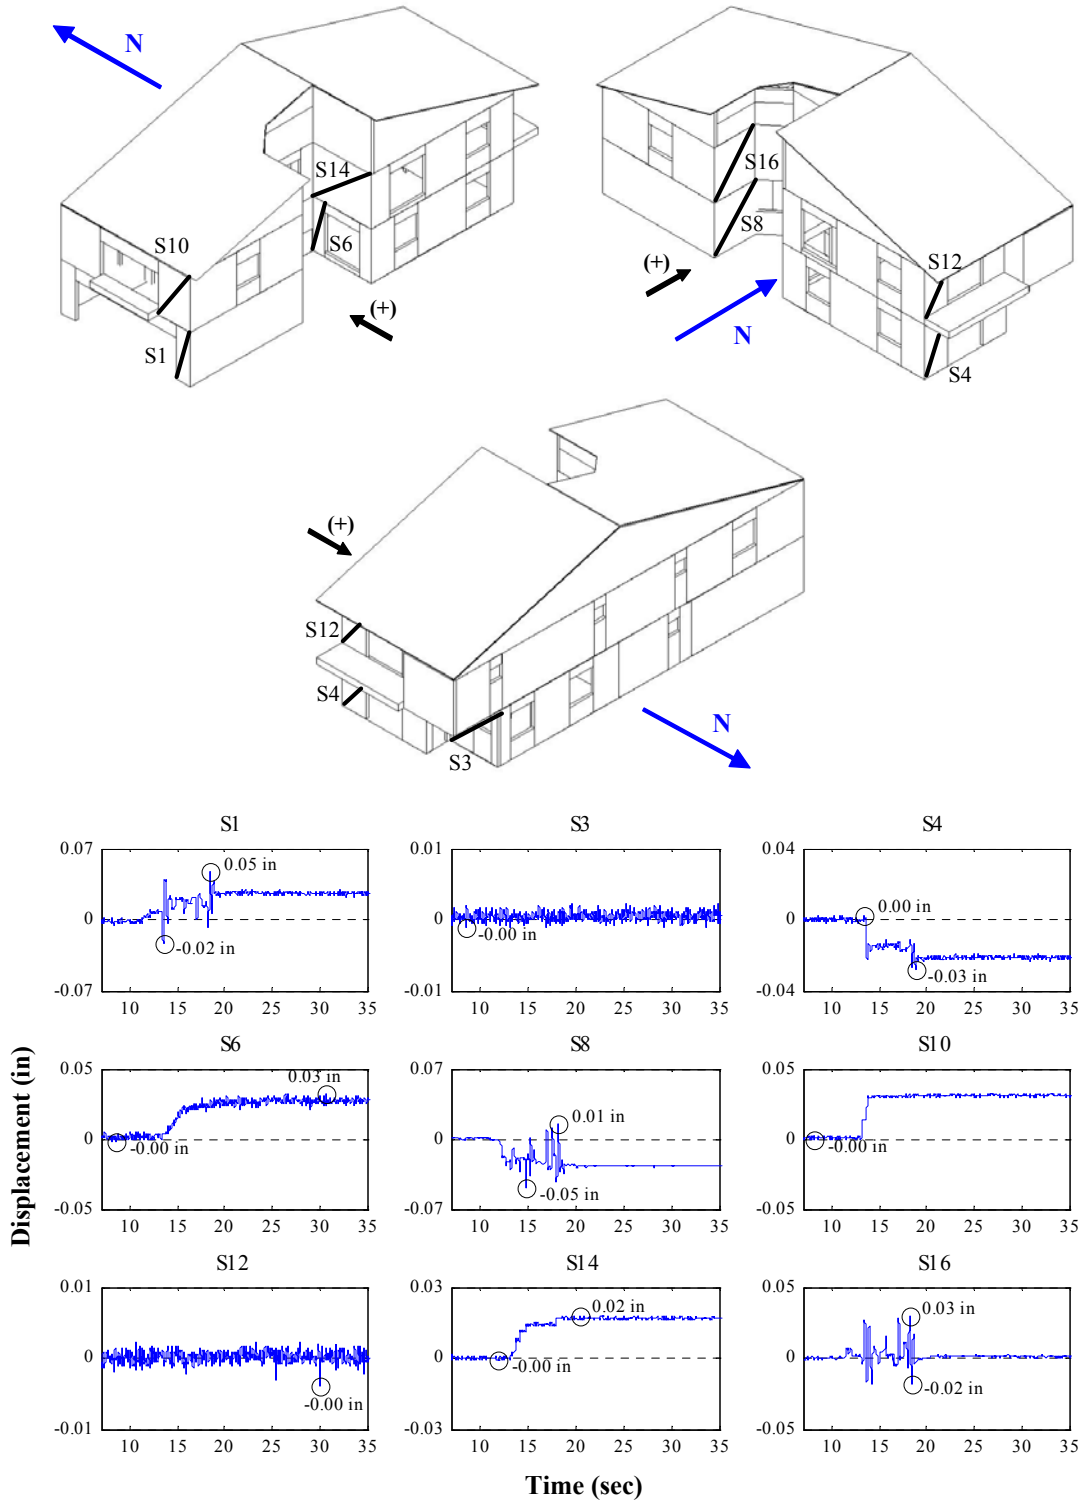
Wall deformations of north-south external walls for Test NWP1S07
